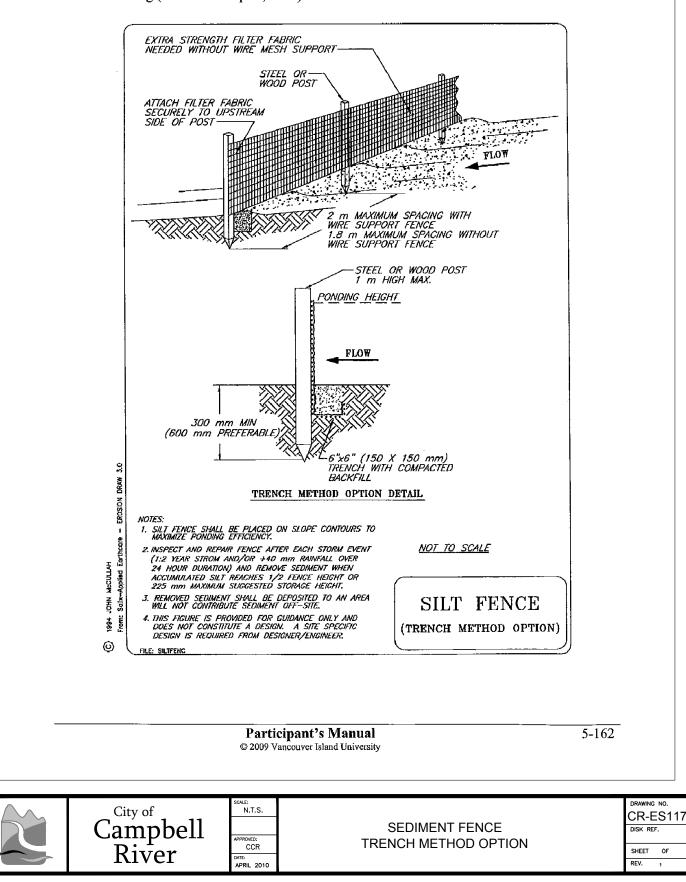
Sediment Fence Installation – Trench Method Typical Drawing (Alberta Transport, 2003)
